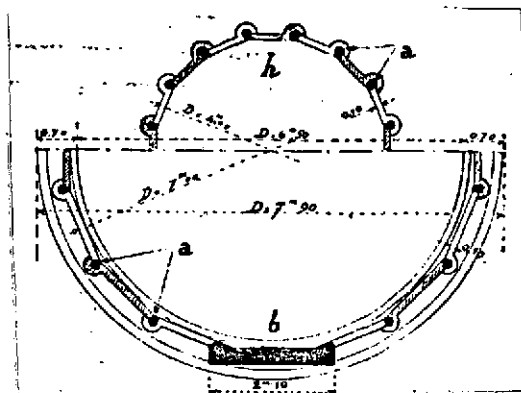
Cross sections of a pylon constructed of reinforced concrete blocks.
